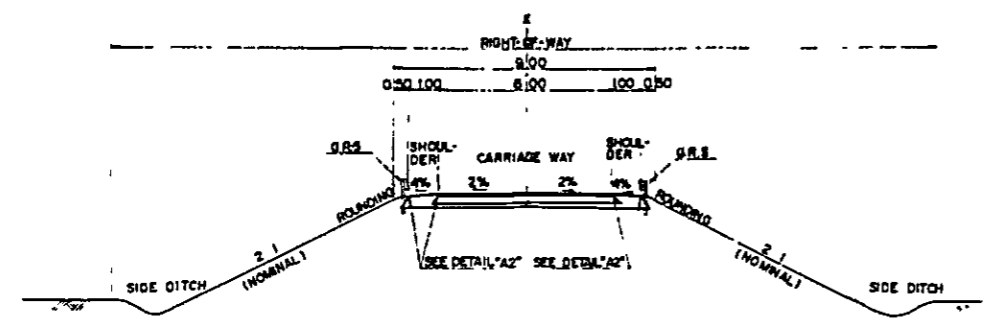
A TYPICAL ROADWAY CROSS SECTIONS
